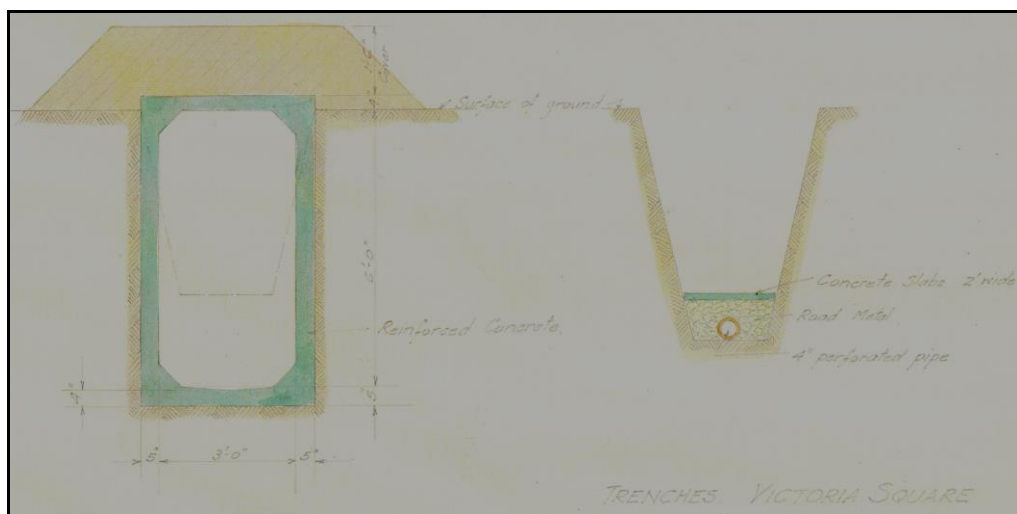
Proposed modifications to open trench shelters (CEF[1942]021).
